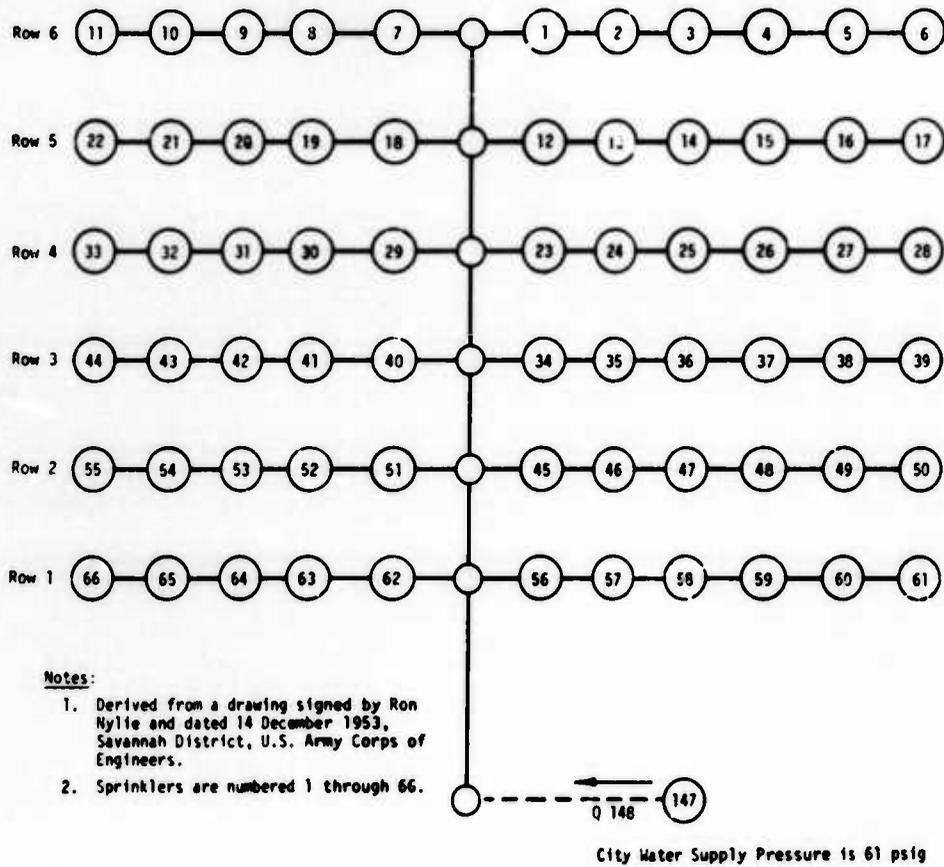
Sprinkler System in Mezzanine of Building 786 at McClellan Air Force Base
